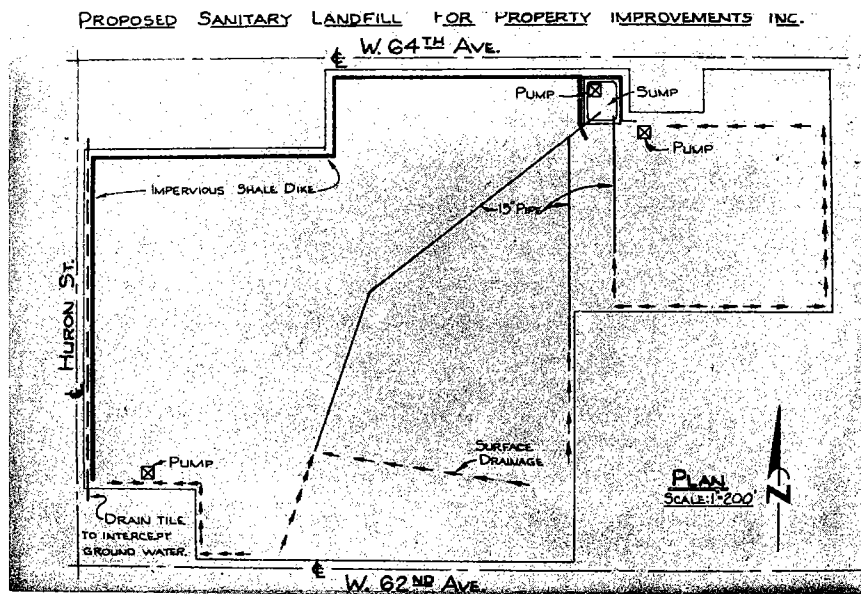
Plan view of pit limits showing drains, sumps and pumps for de-watering the pit. The impervious shale dike will continue around pit perimeter as gravel is removed and additional trash disposal areas are needed.
